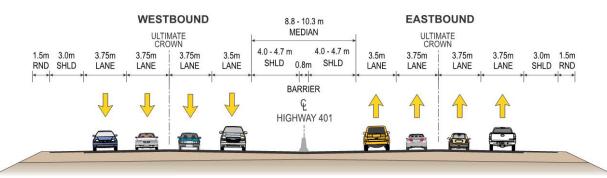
Highway 401 Section 6, Existing and Proposed Cross-Sections
